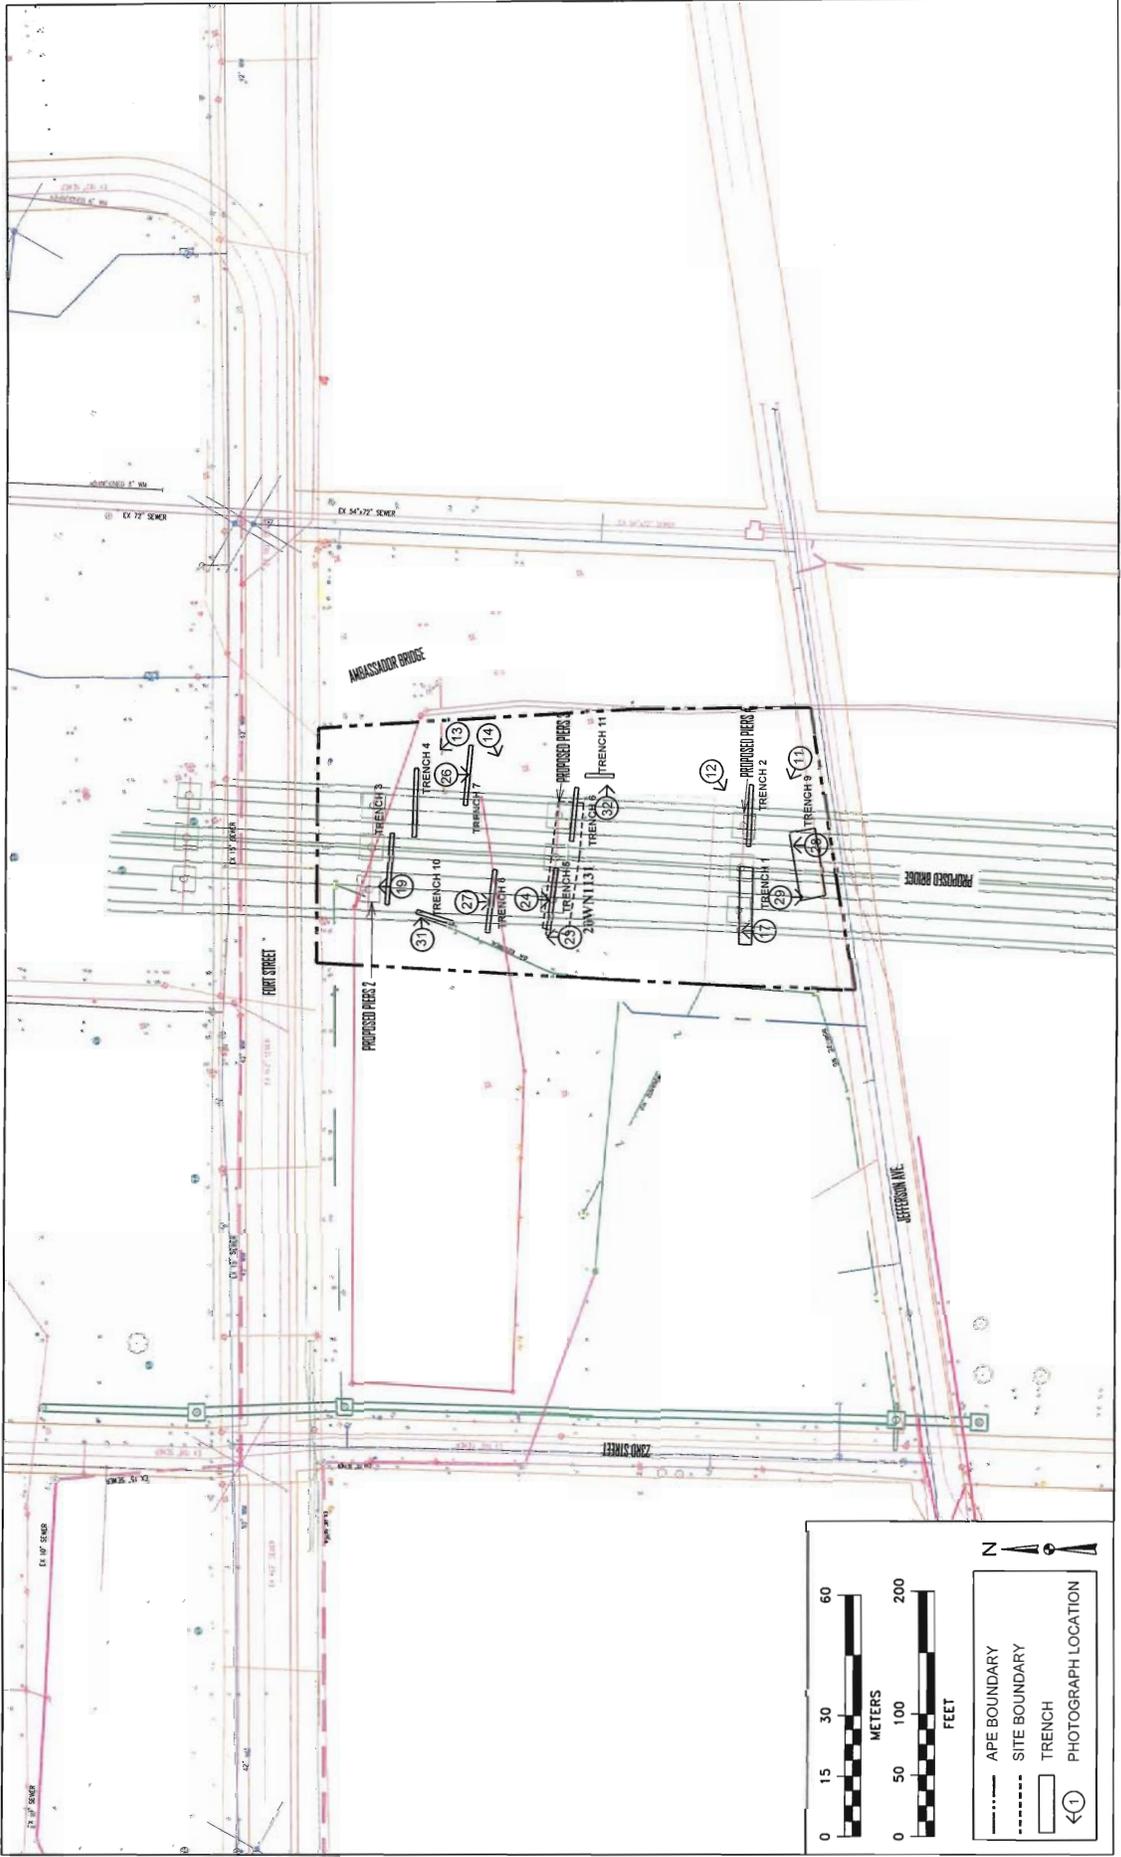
Project map showing trenches, photo locations, and 20WN1131.
